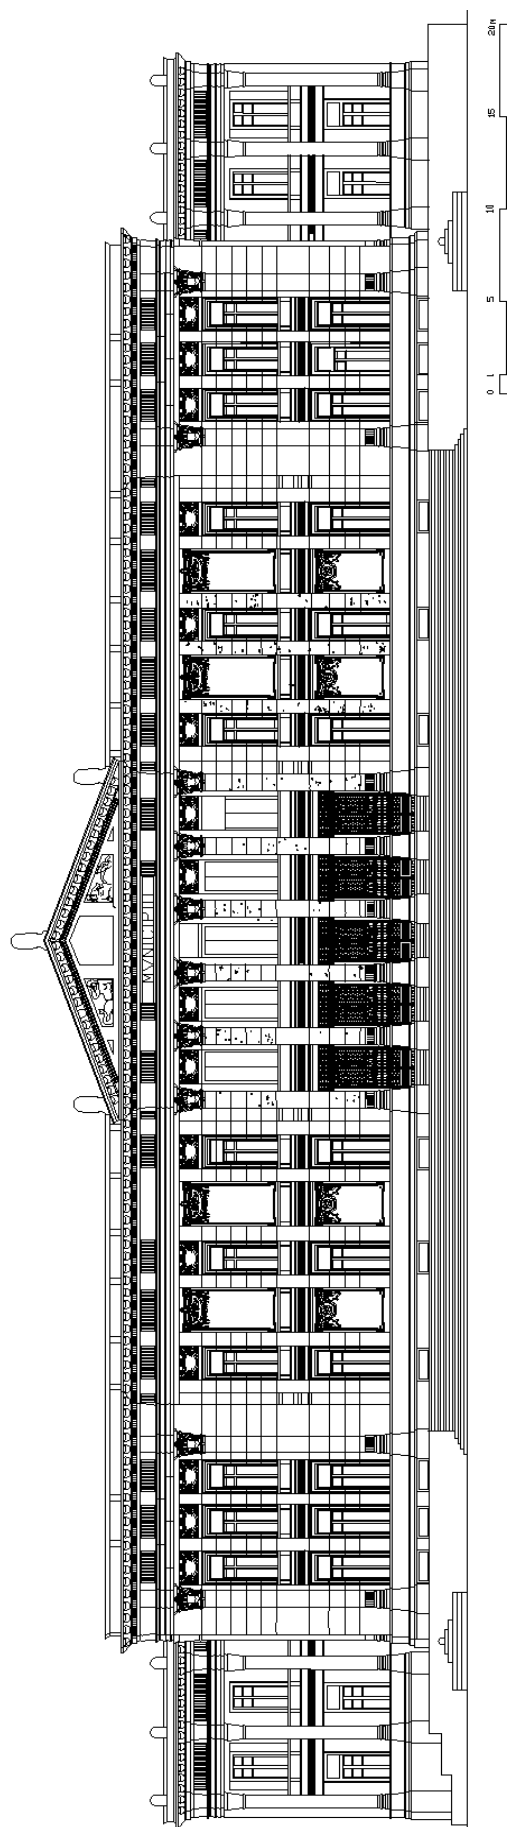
ELEVATION PLAN FROM EUROPEAN UNION SQUARE
